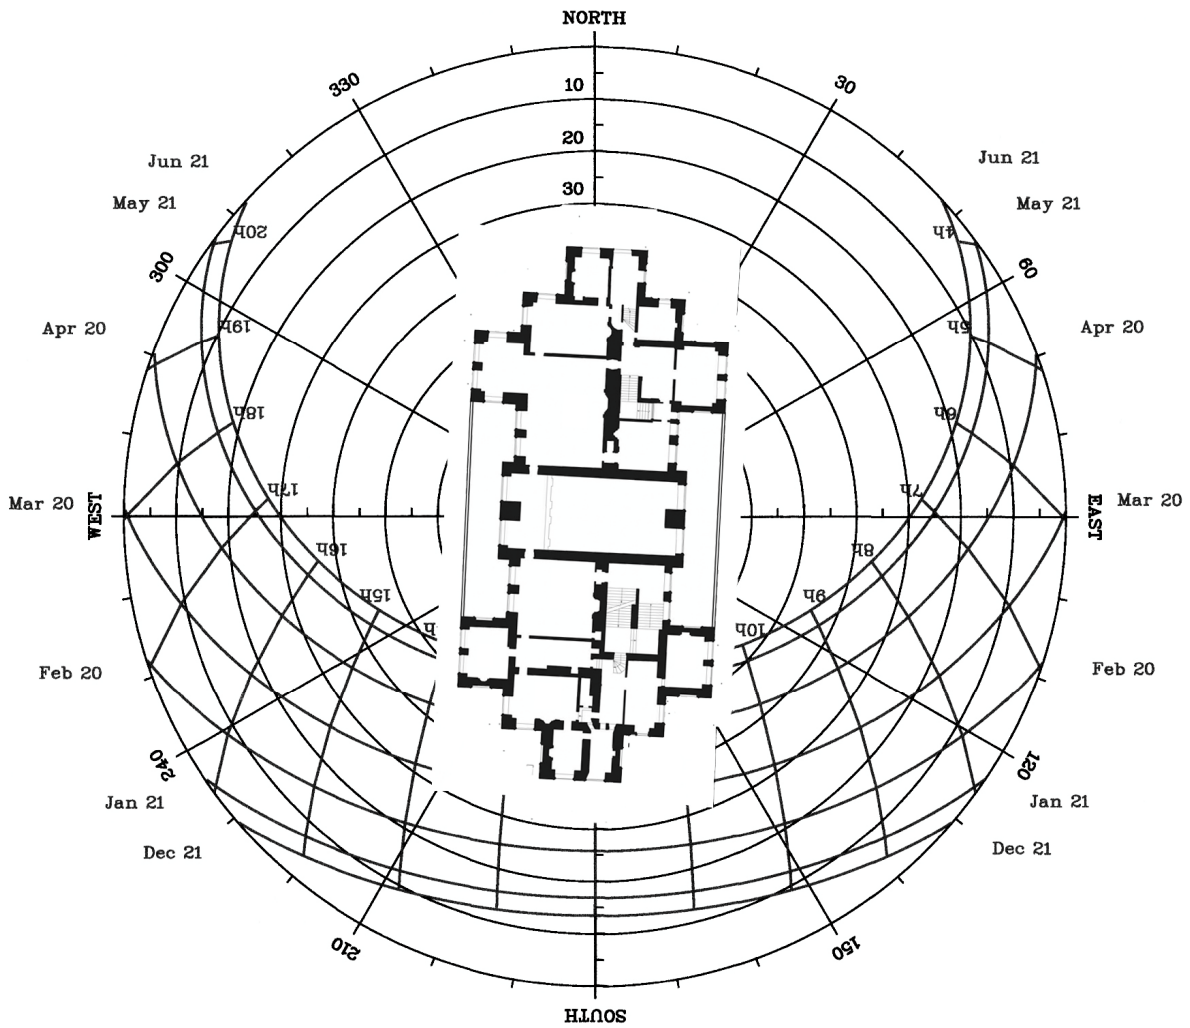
First Floor Plan with sunpath diagram. Author 2. Plan drawing by Luke Kon.
